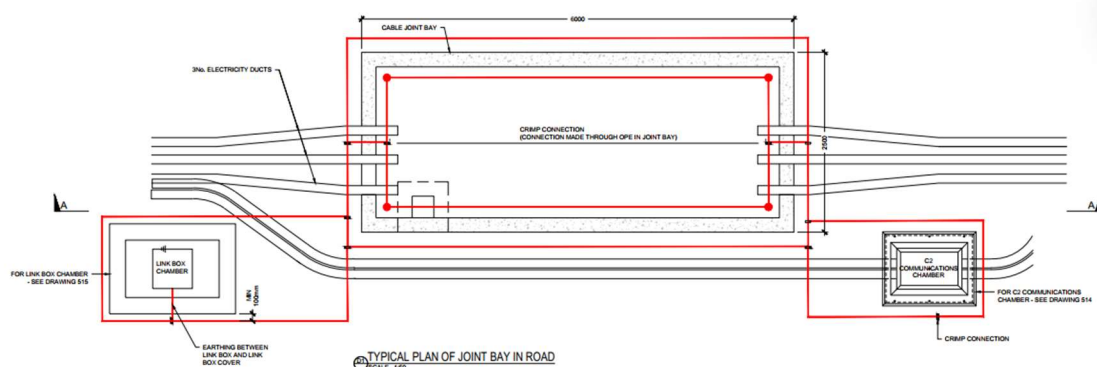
Joint Bay and Associated Chambers Arrangement
